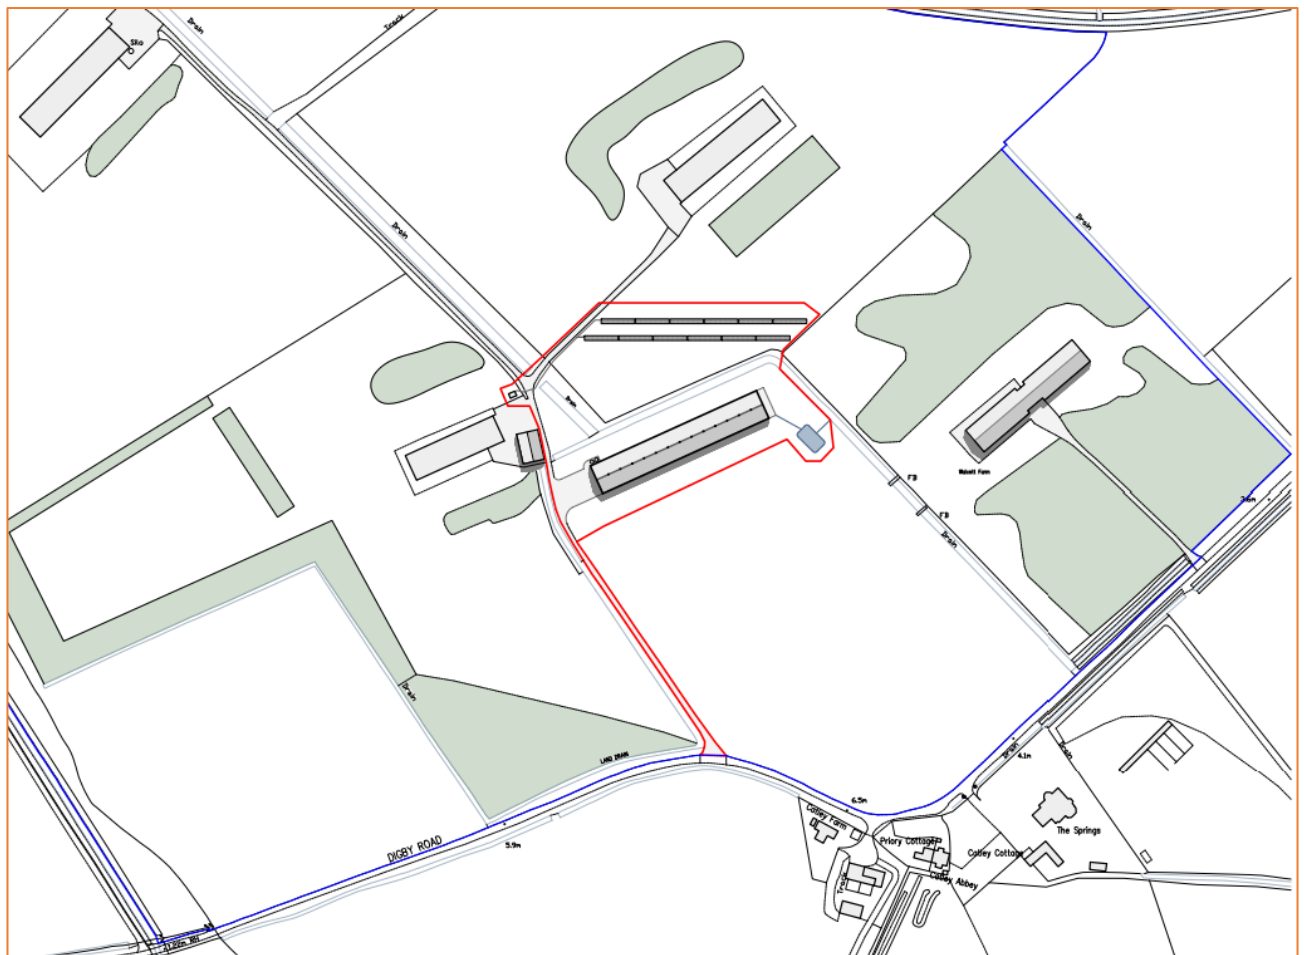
Site location plan (Source: Ian Pick Associates Ltd)
